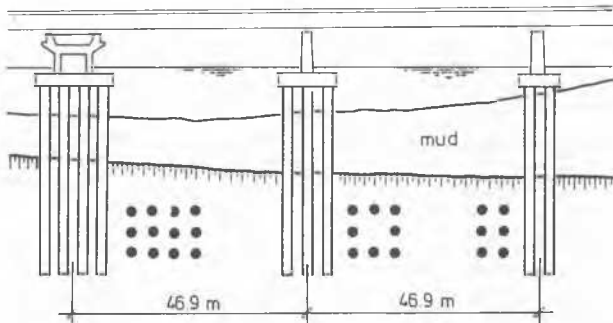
Typical pier foundations of Shatt-al-Arab Bridge, Iraq
